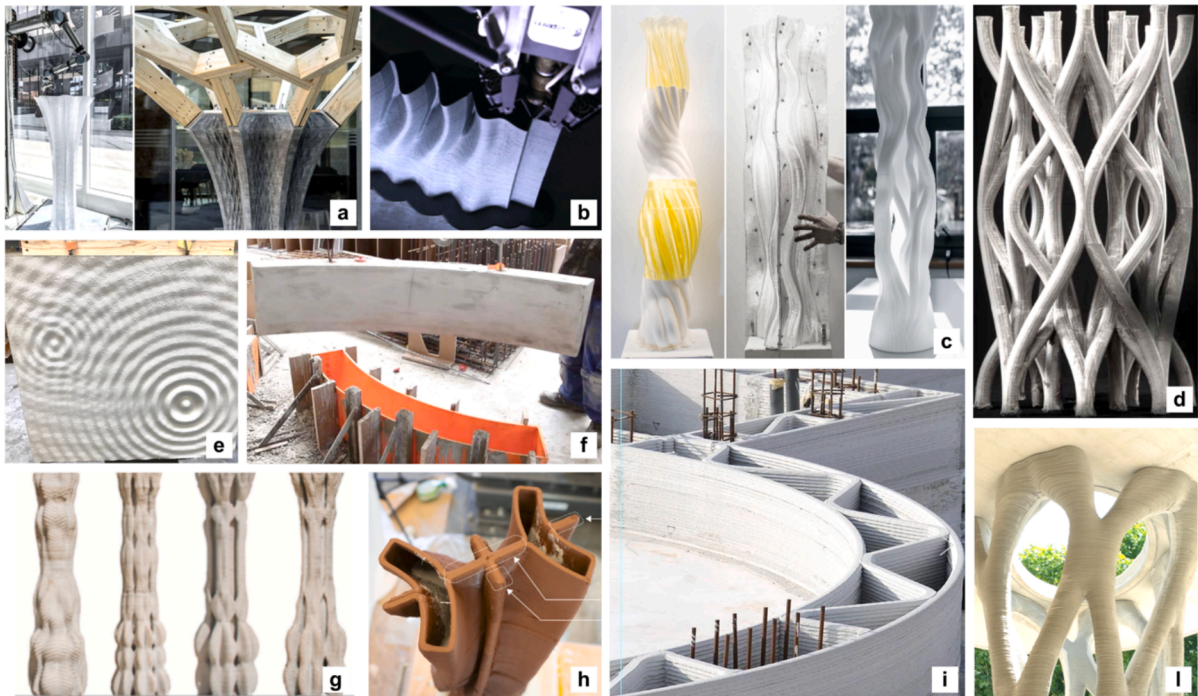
A) column from the project future tree pavilion [47], b) High-Resolution PanelNaboni and Brescegello [48], c) Additive thermoplastic formwork for casted columns [70], d) Submillimeter formwork for complex columns or truss [49], e) Water drop facade wall from the company BigRep[50], f) Concrete arch from the company BigRep [51], g) Bespoke columns [75], h) clay formwork to cast concrete column [19], i) embedded column in 3d printed two-storey office in Dubai [20], l) Truss-shaped pillarsGaudillière et al. [52].
